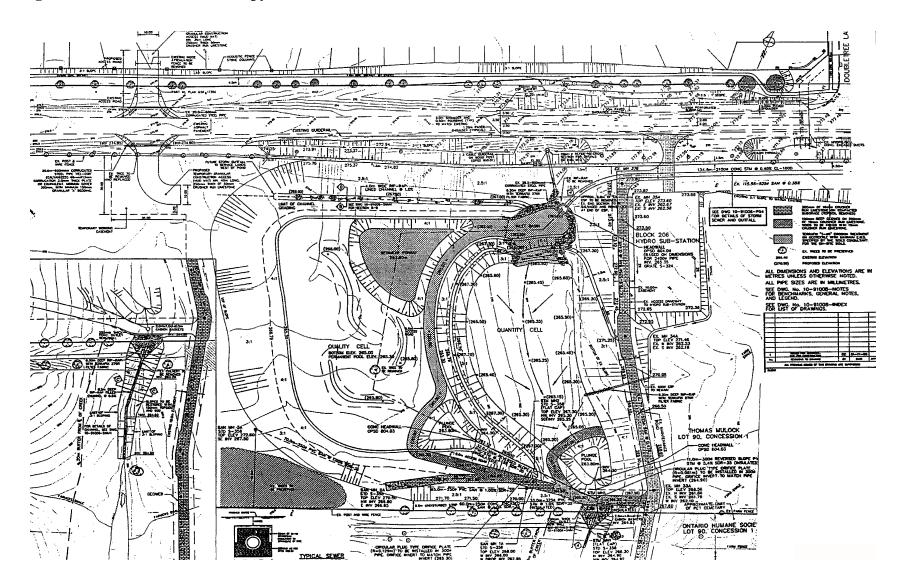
Detail Sheet showing the Design of Inlet and Outlet Structures
